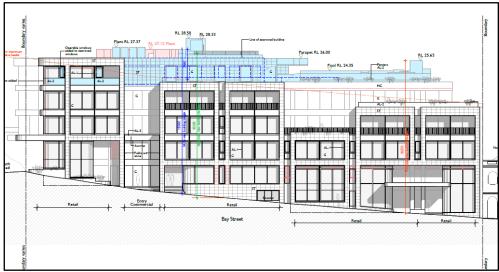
Eastern elevation of the Proposal. Source: Lawton Hurley
